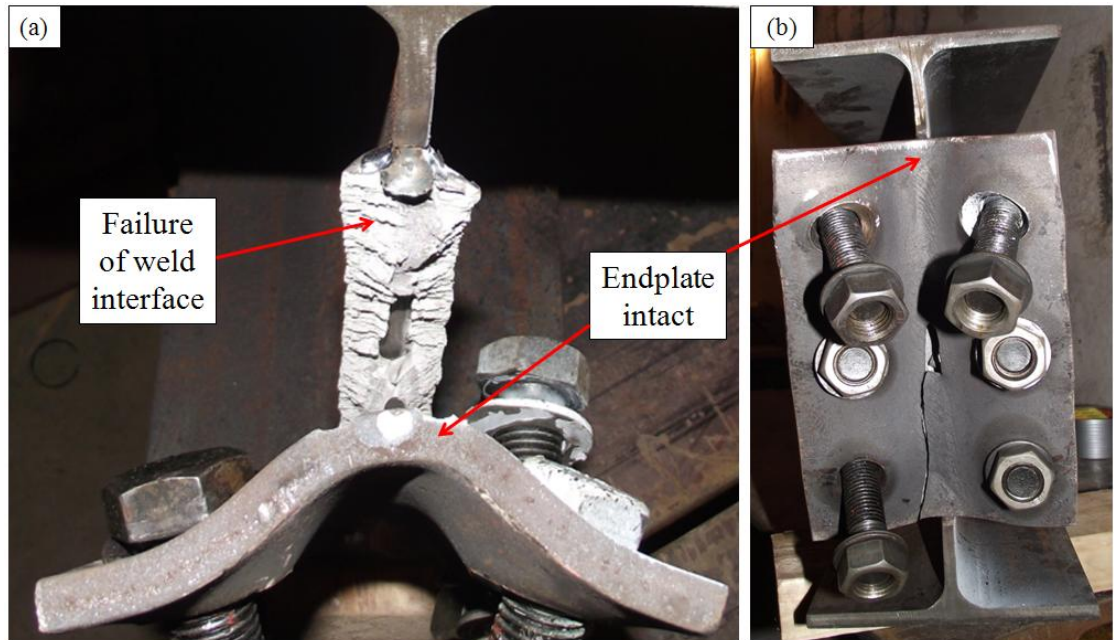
FEP15 failure showing the face of the end-plate torn away from the weld
